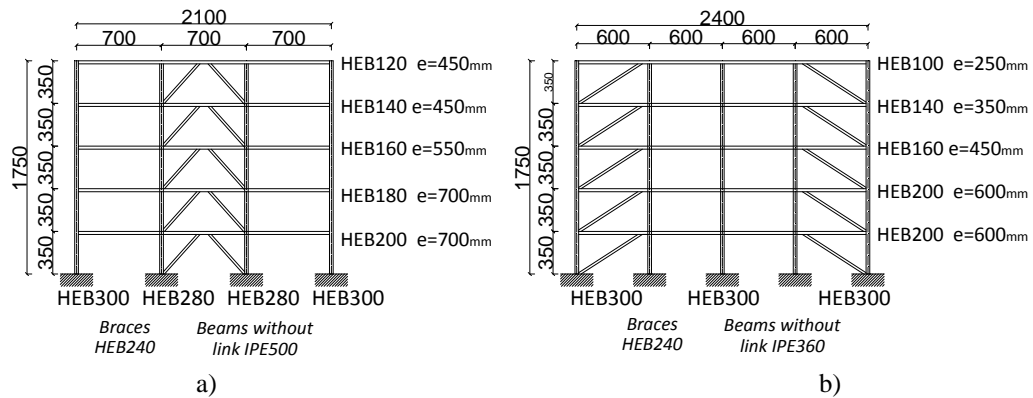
Building 3 (short links), geometry and elements: a) xz frame, b) yz frame.
